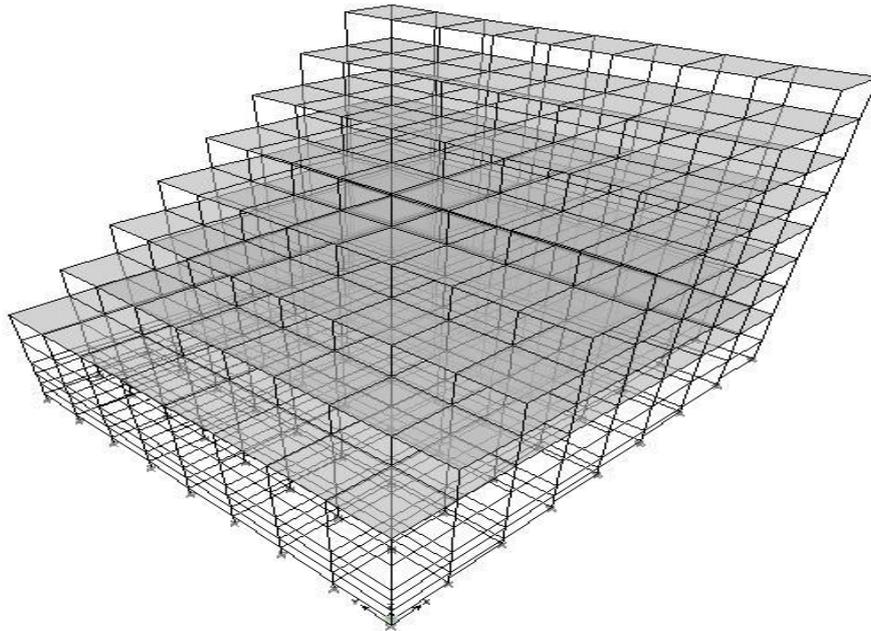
SET BACK & STEP BACK BUILDING WITH 10°SLOPE (STOREY 8, 9, 10)
